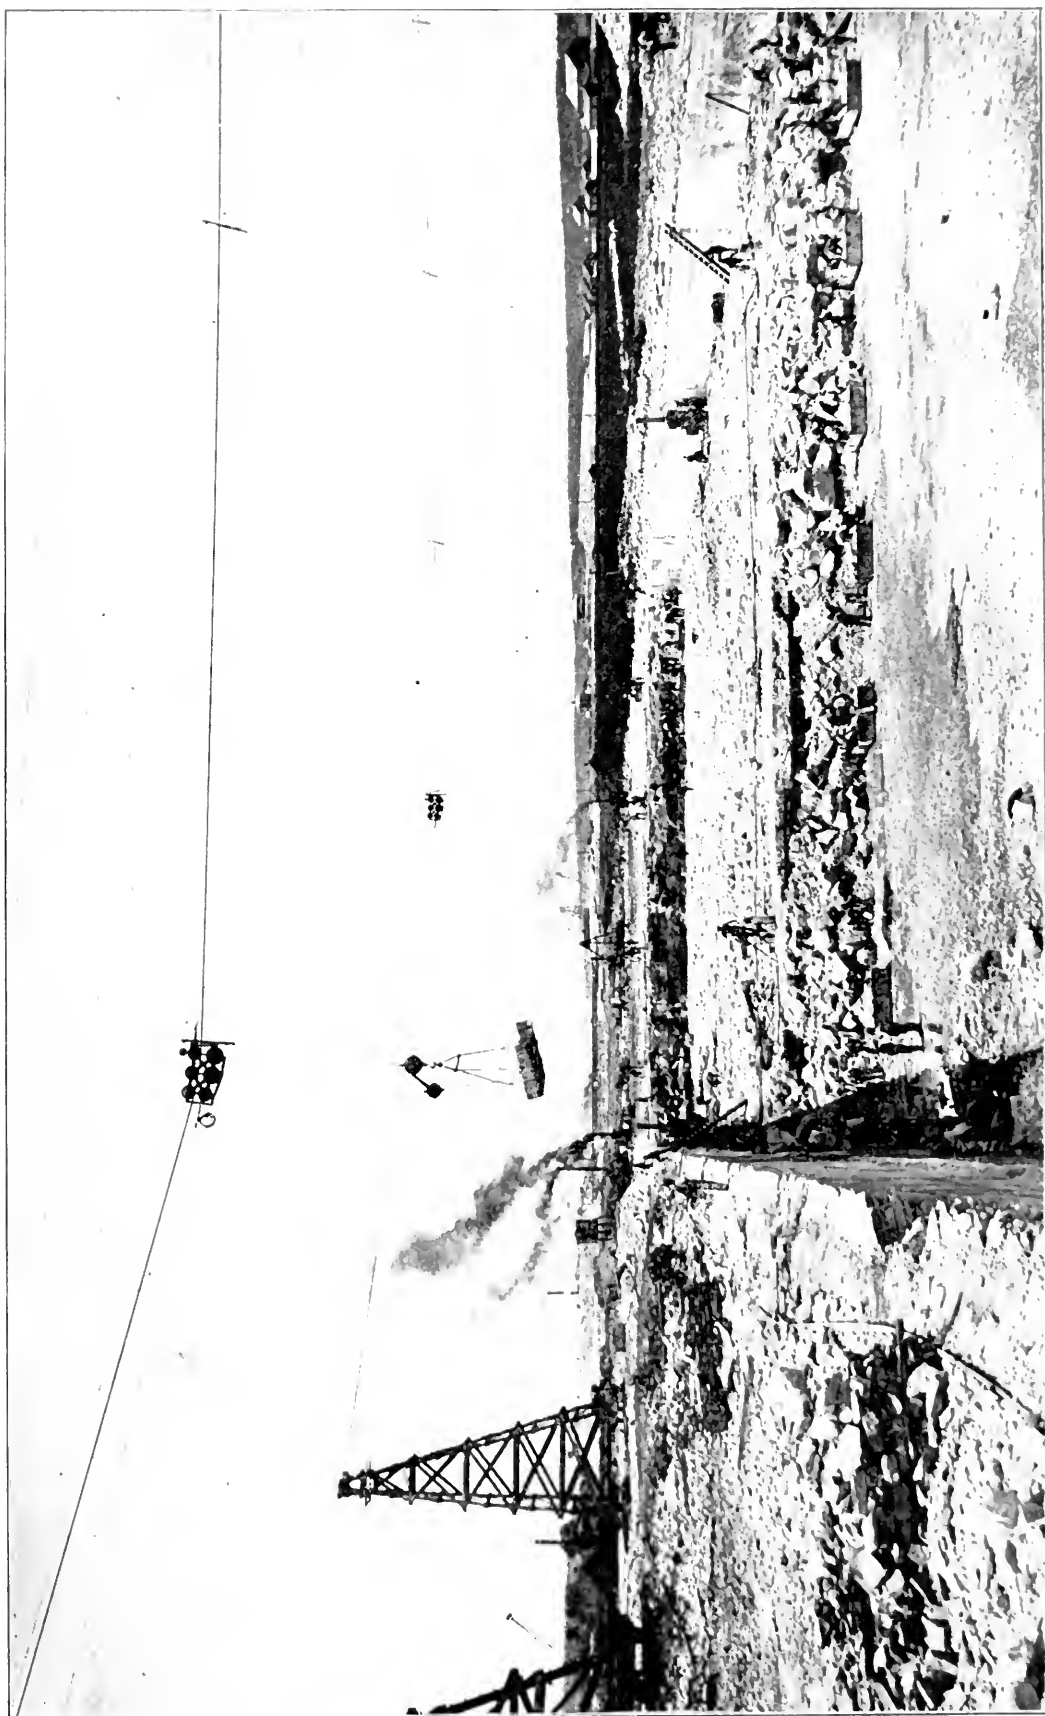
SHOWING ARRANGEMENT OF SKIP AT A FACE FOR THE CABLE HOIST CONVEYOR.
